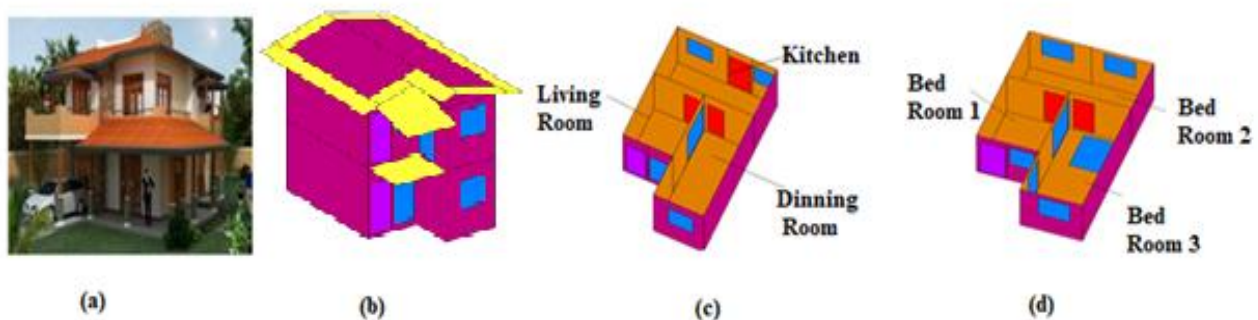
(a) Actual scale residential house (b) 3-D (c) first-floor plan view (d) second-floor plan view of simulated residential House
